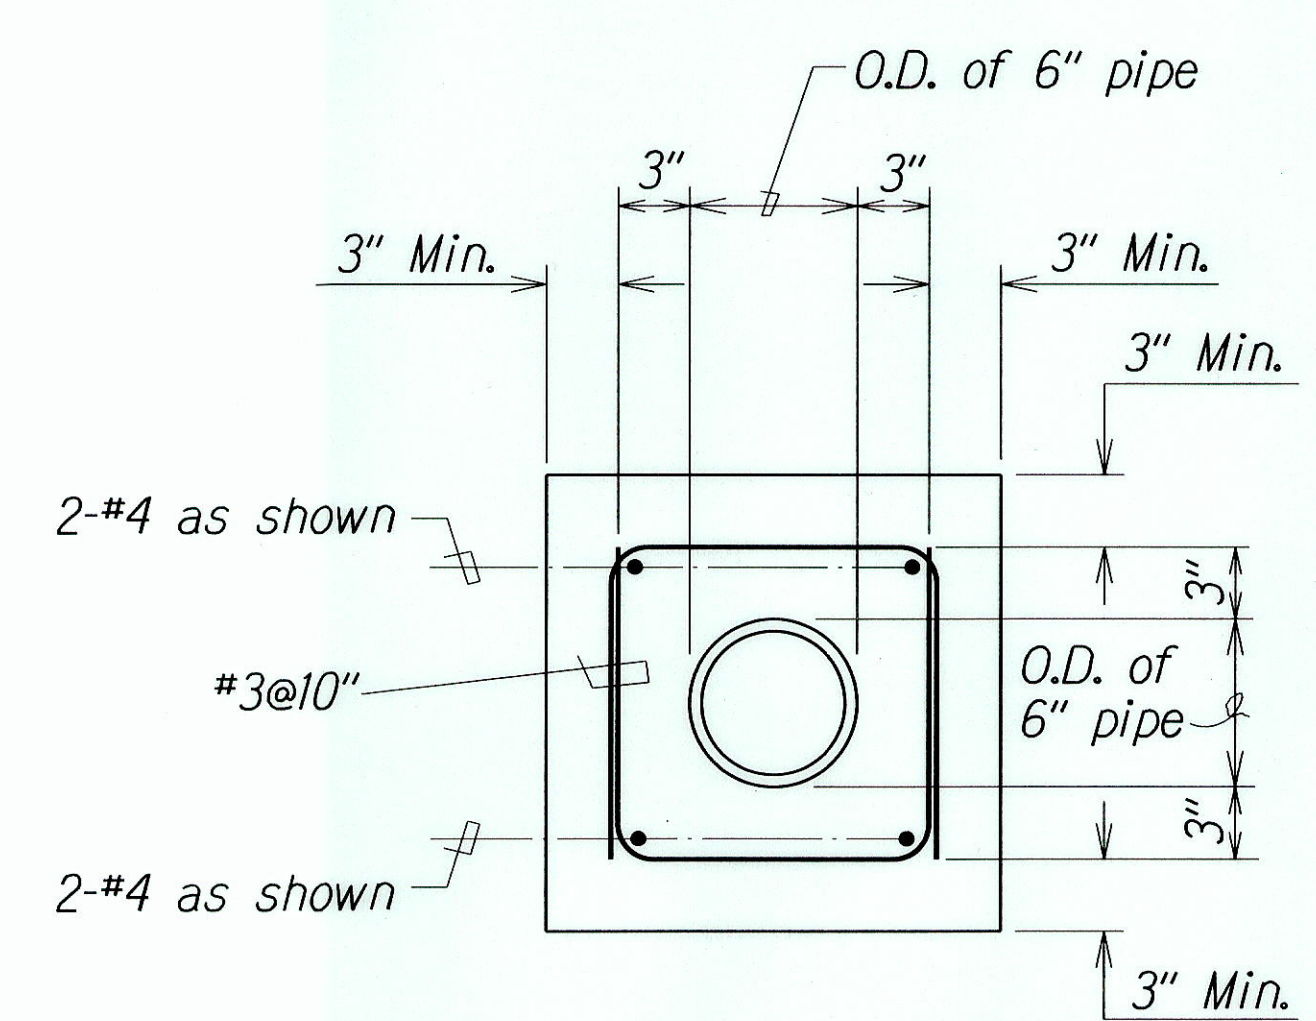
DETAIL OF CULVERT TRENCH AND REINFORCED CONCRETE JACKET
